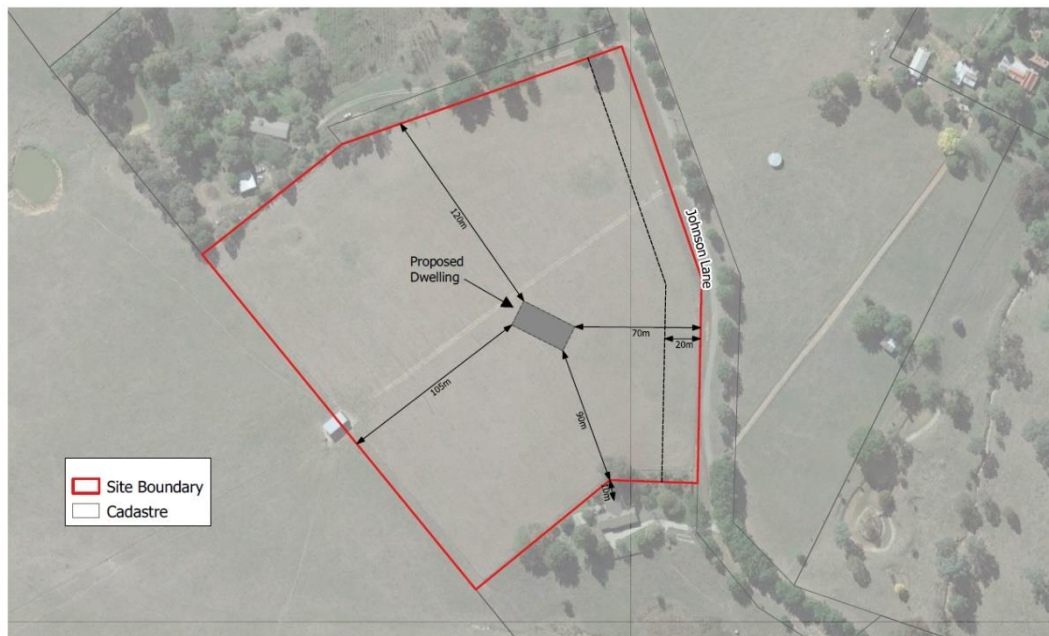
Proposed Site Plan (Source: Habitat Planning)
